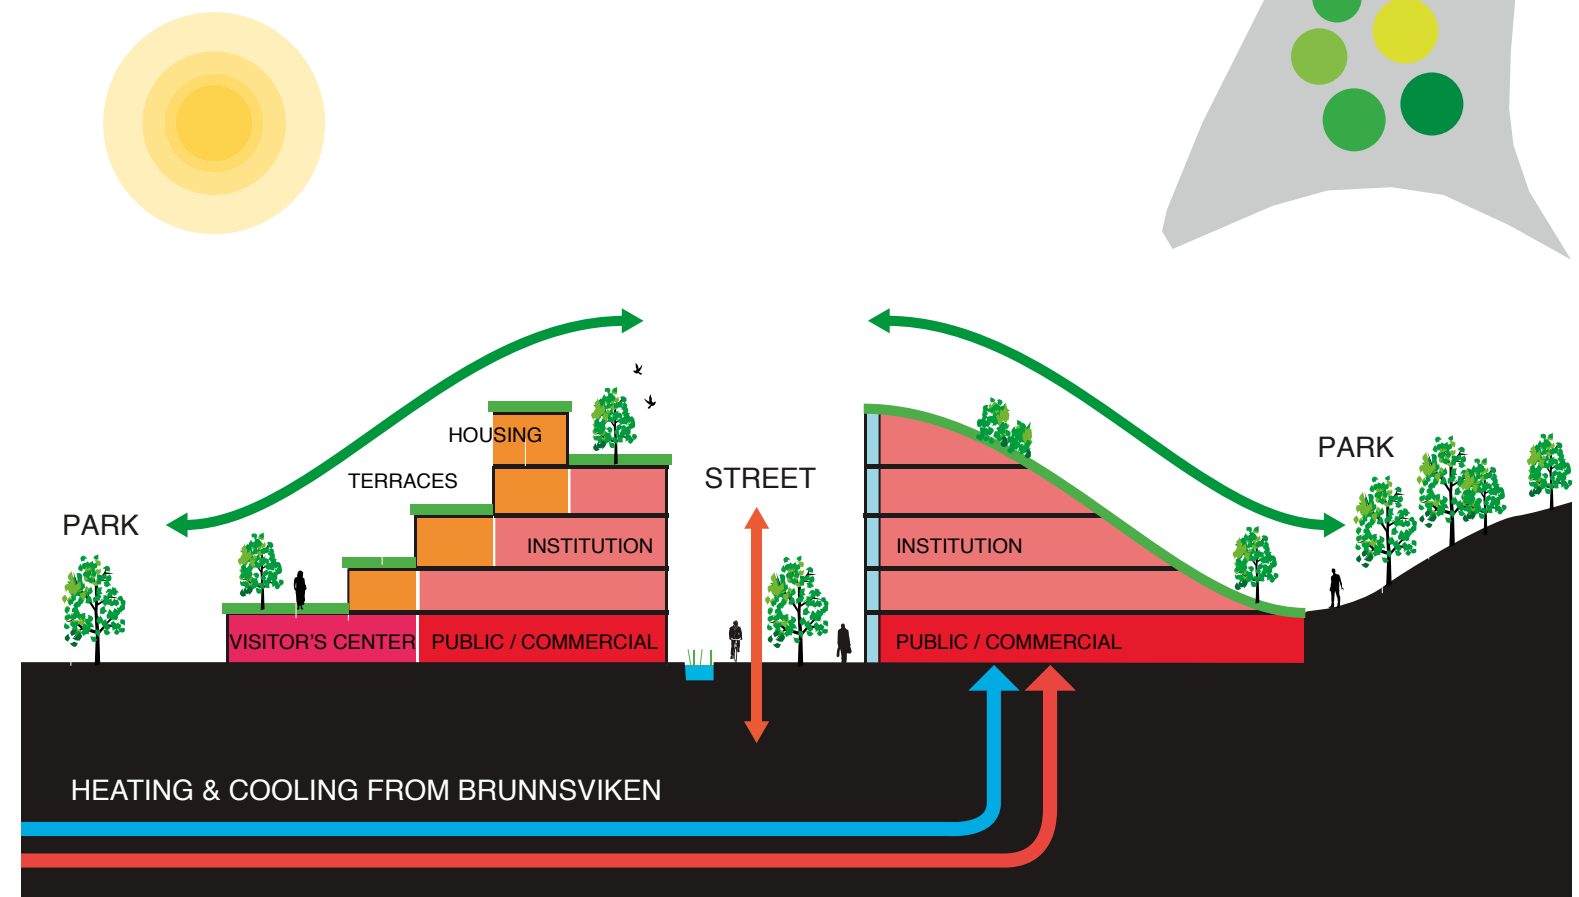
Conceptual outline. Unbroken urban feeling one way and unbroken park feeling the other. Residential apartments with terraces facing south and west at the upper floors.
